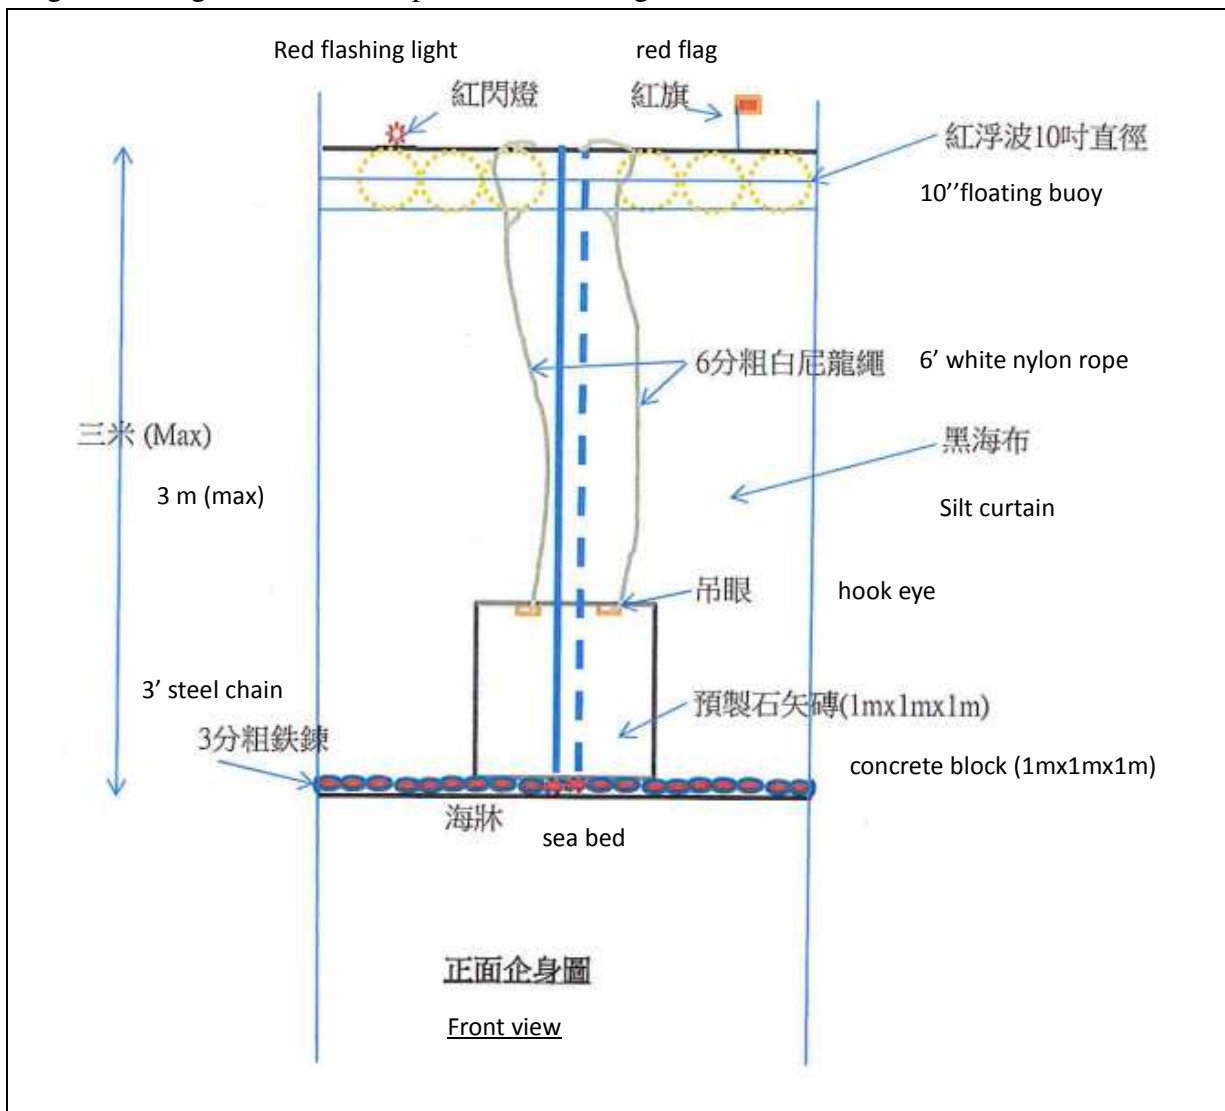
Demonstration of the fencing structure with concrete blocks and silt curtain in water
